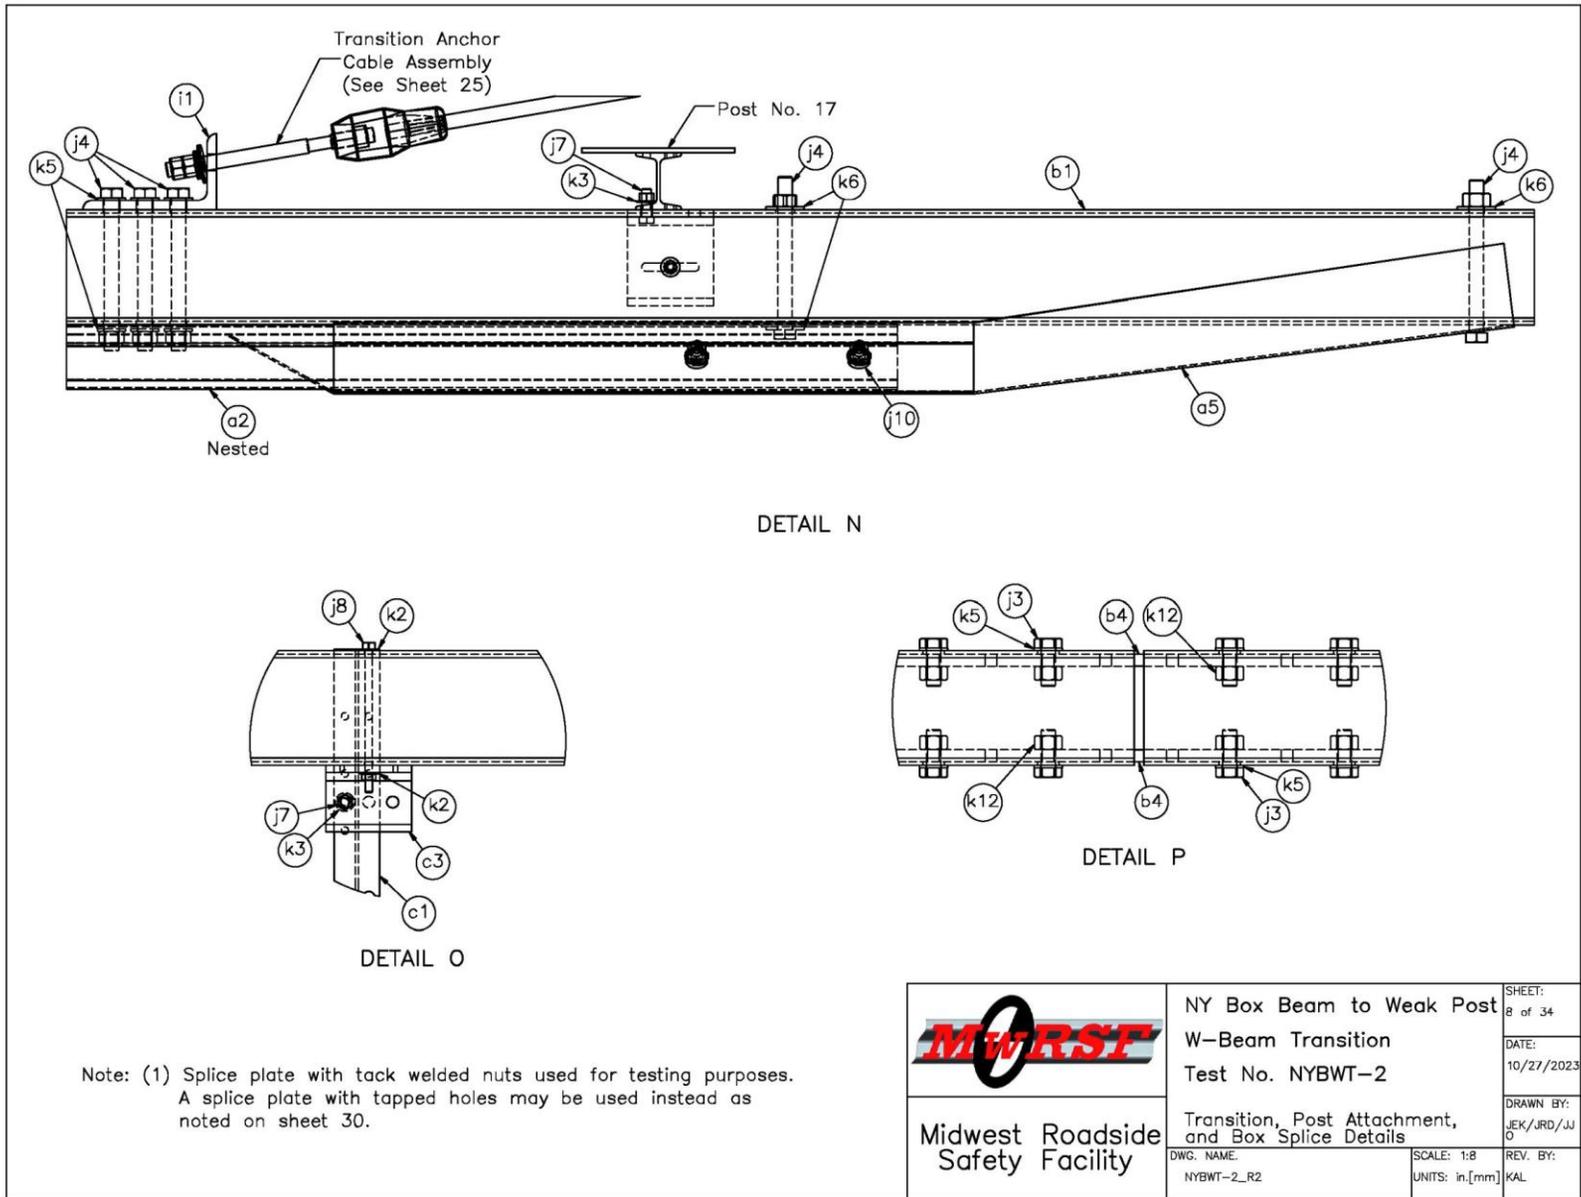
Transition, Post Attachment, and Box Splice Details, Test No. NYBWT-2
